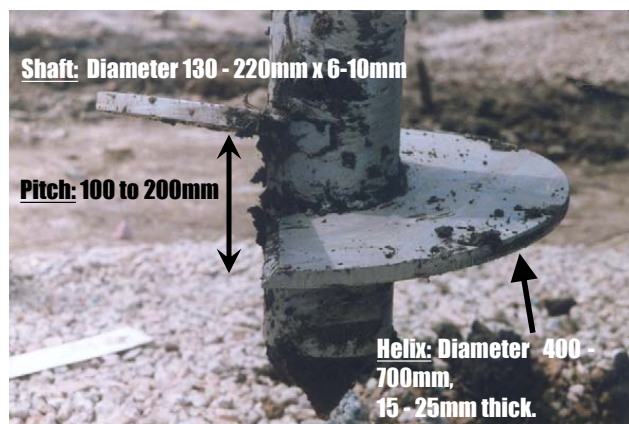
Typical dimensions of “heavy duty” steel screw piles
